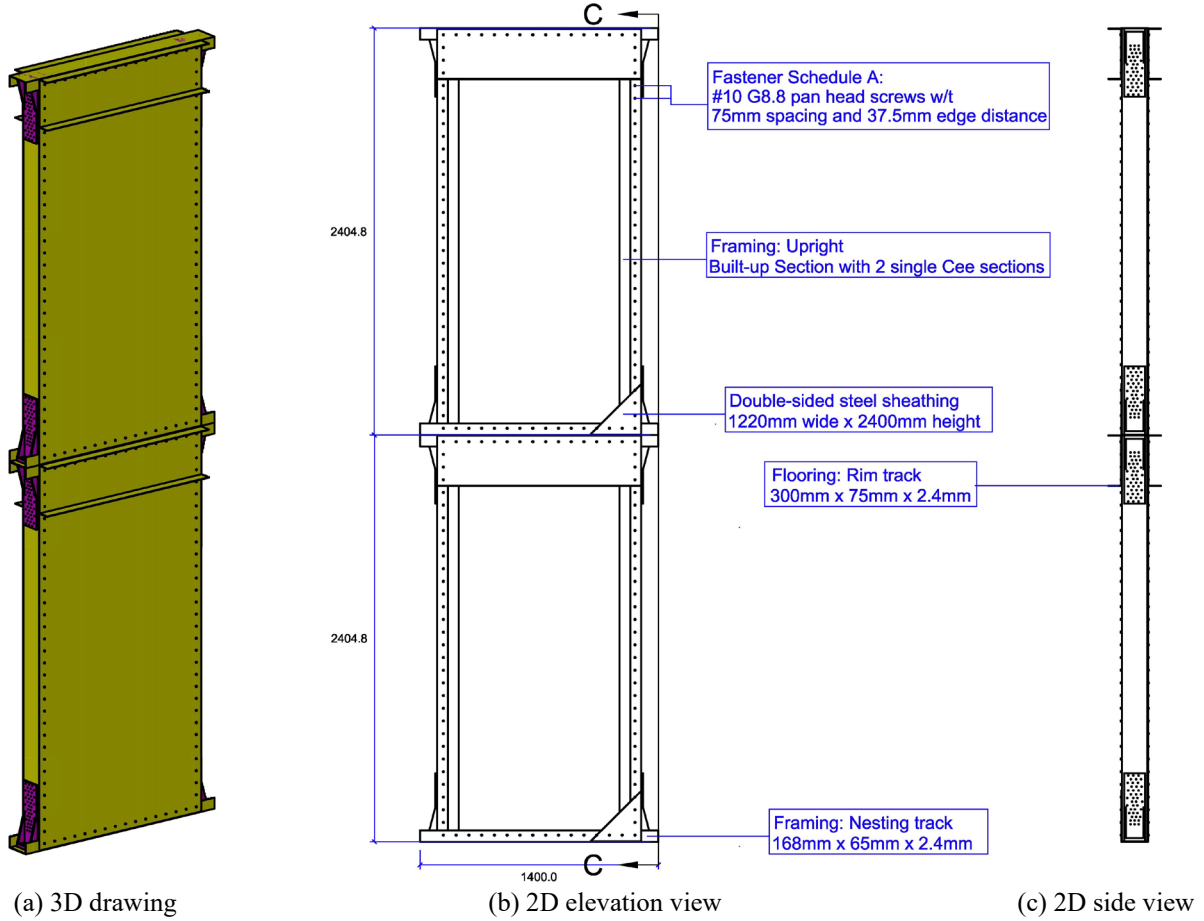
3D and side views drawings of specimen BU2C-10D-1-M-1
